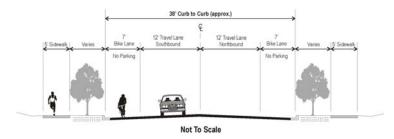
Typical Section-Baker Avenue (10th Street to 13th Street)
